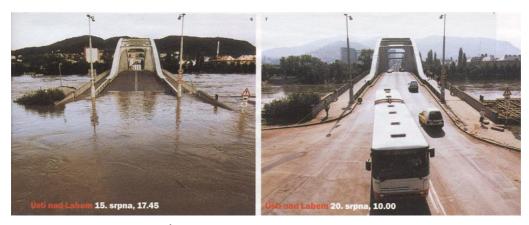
Flooded bridge in town Ústí nad Labem over river Labe (Elbe). Flood wave shorter than 5 days.
